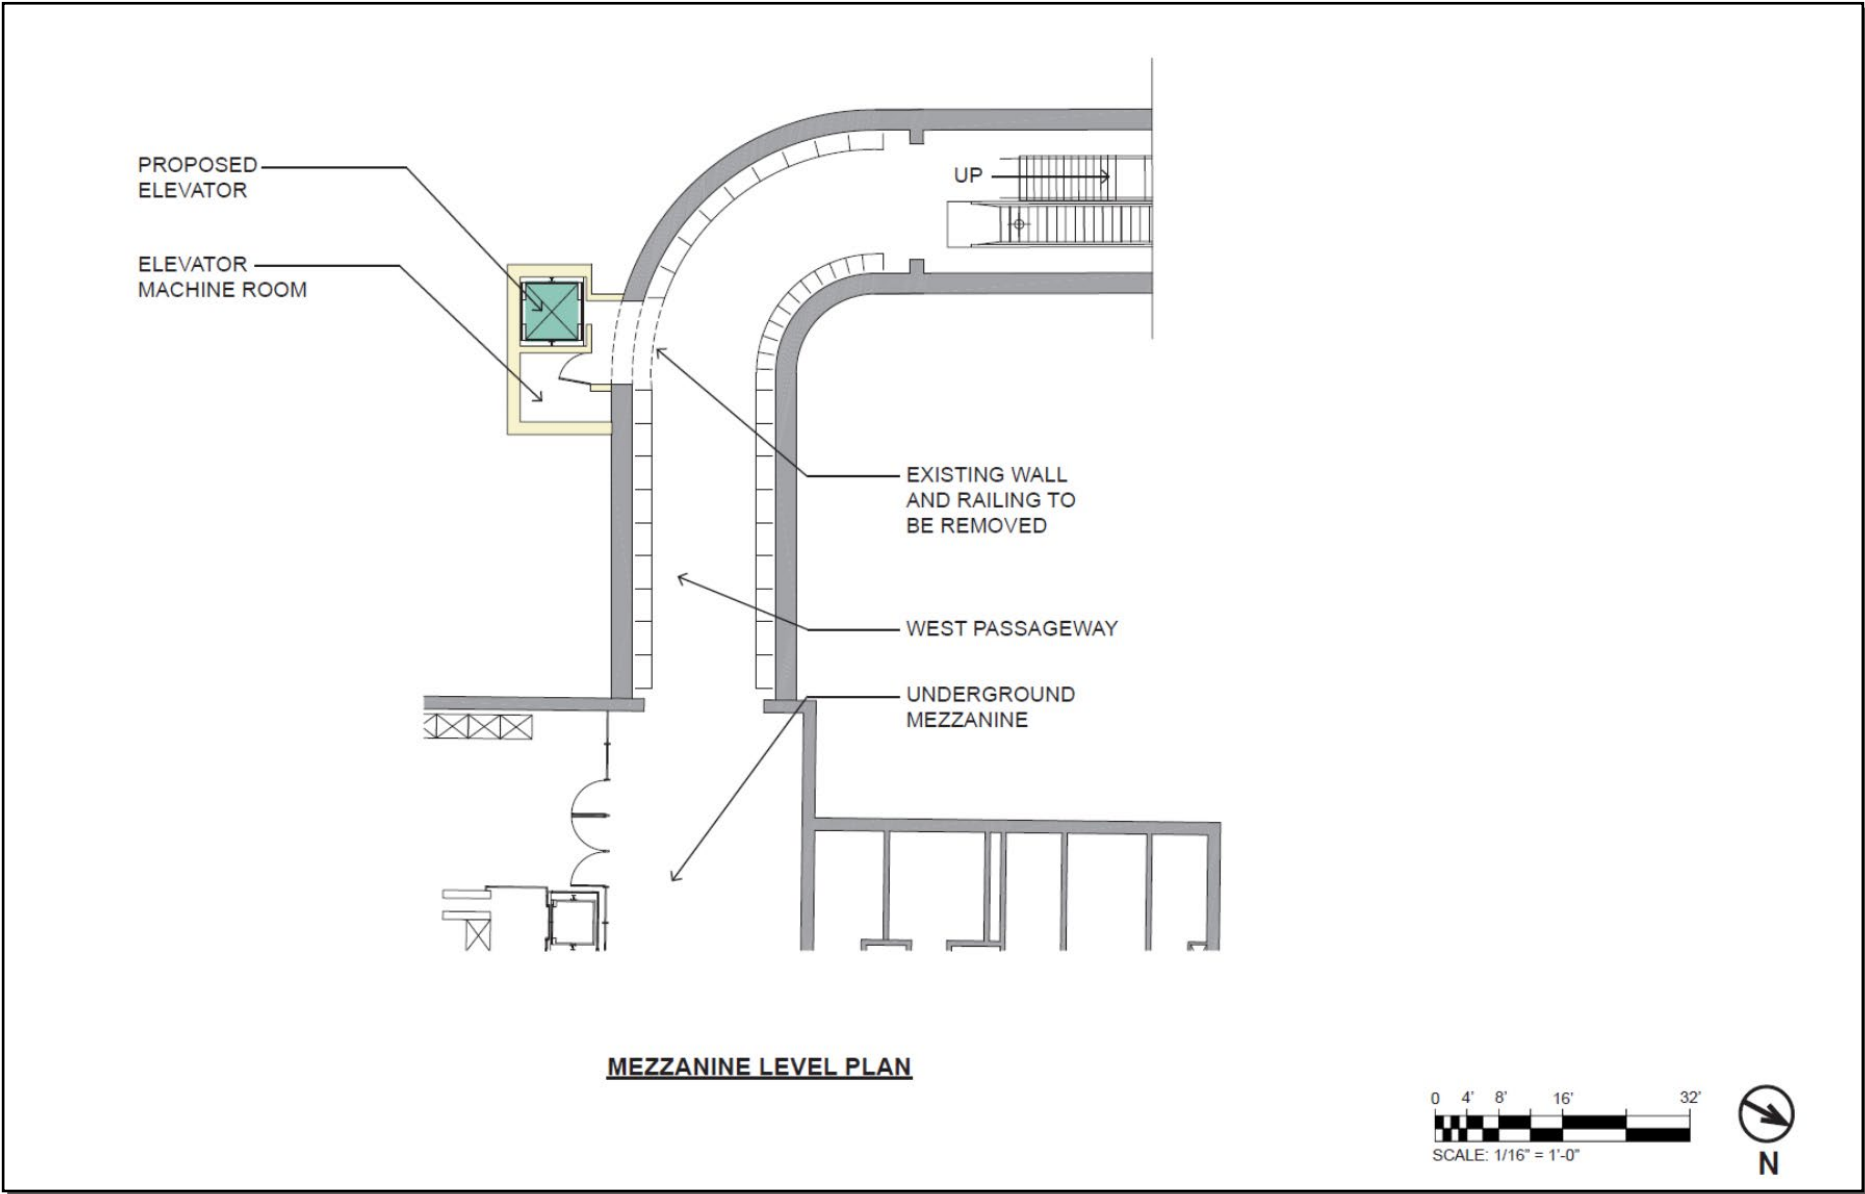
Option 3A Plan Drawing (Mezzanine Level)
